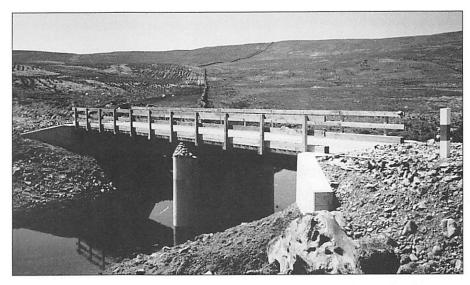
Pollution free construction by means of a steel beam/timber deck bridge.
